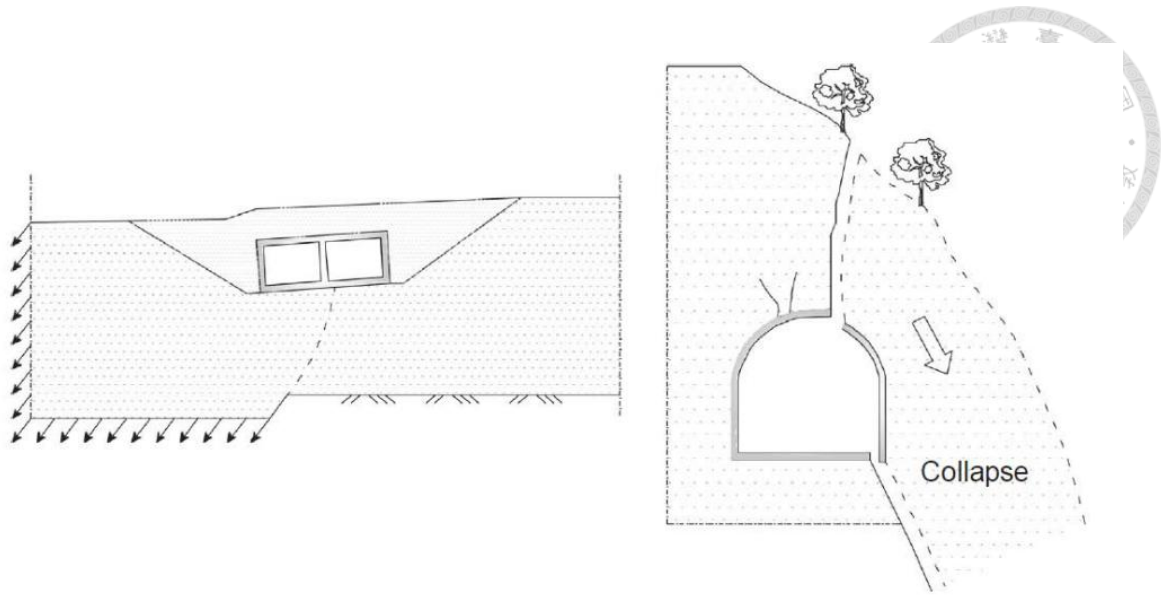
Illustration of common tunnel damage due to ground failure (Tsinidis et al., 2020)
